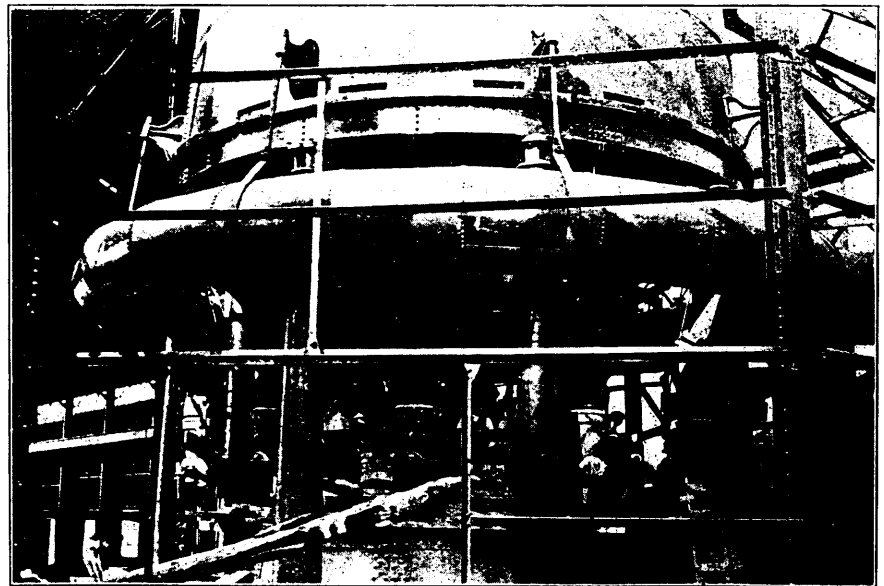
HAMILTON STEEL AND IRON CO.'S PLANT—BLAST FURNACE IN CONSTRUCTION SHOWING HOT AIR BLAST TUBES.
